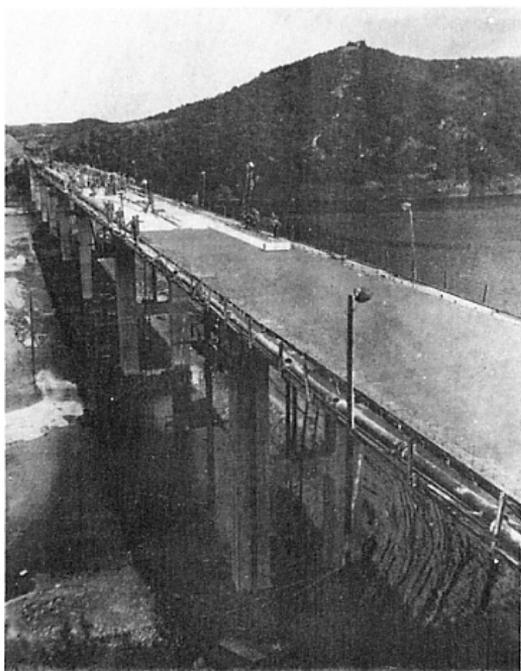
Concrete deck being covered with burlap, at center, prior to receiving a seven-day water cure. A flood gauge is visible on pier 1 in foreground.
